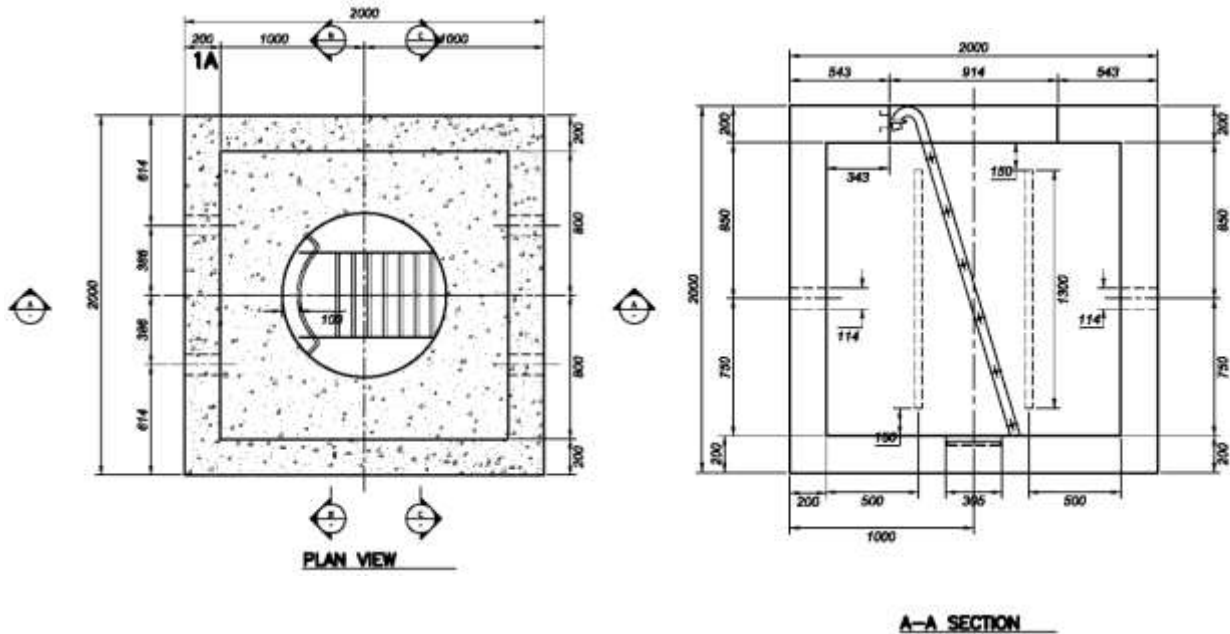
Beach manhole typical plan view and cross section (dimensions in mm).
